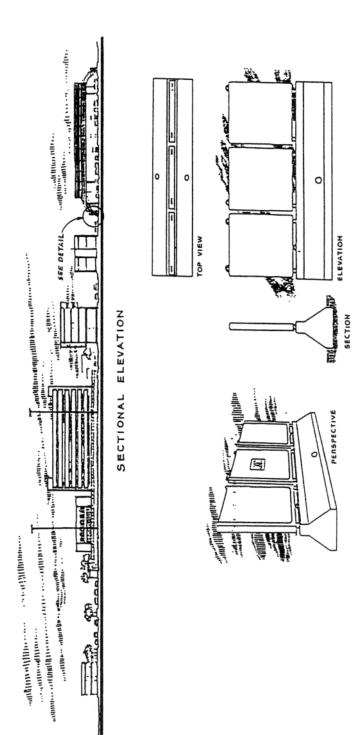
Sectional elevation through Faculty of Engineering showing physical relation of buildings and adjoining roads. Details of prefabricated pannels of the boundary wall can also be seen.
